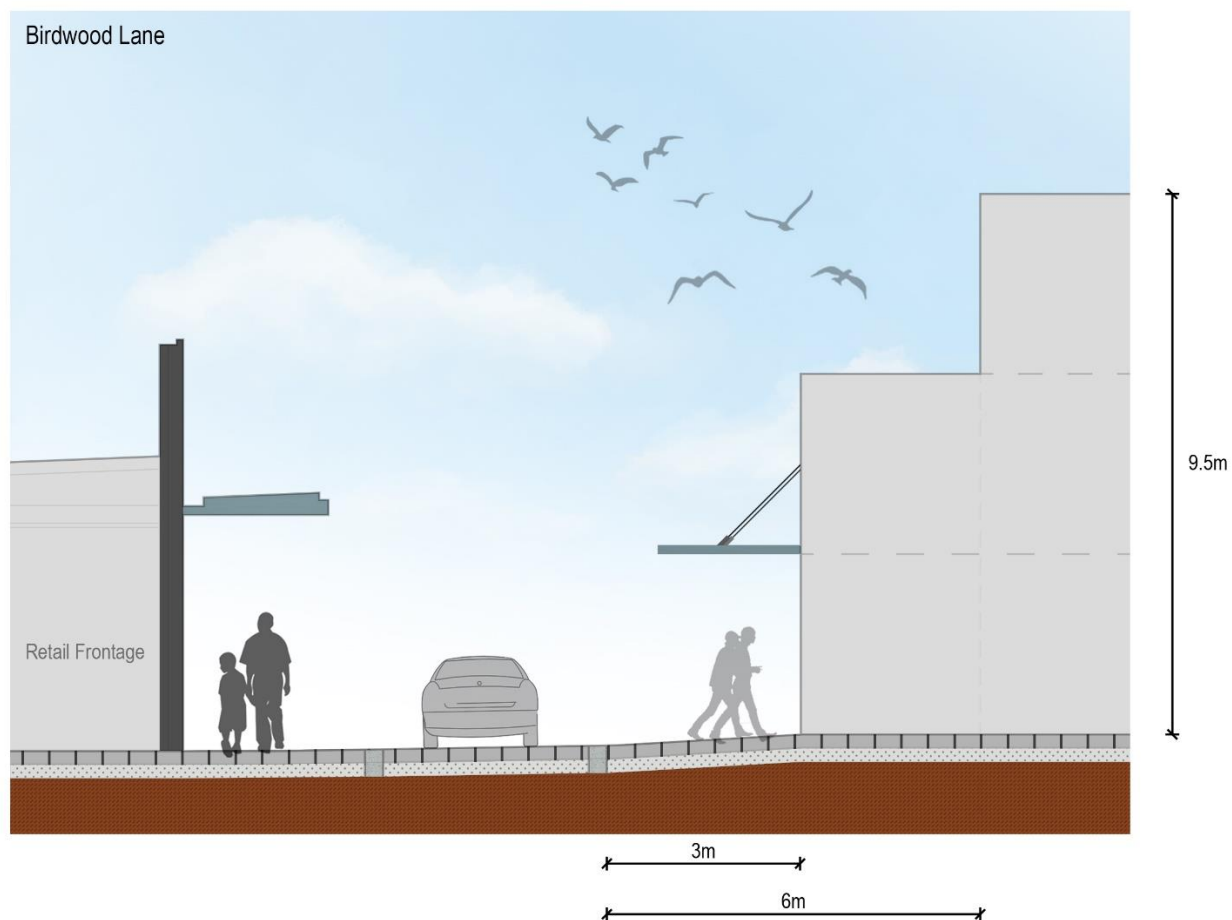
Front Setback – Birdwood Lane looking north towards Birdwood Avenue
